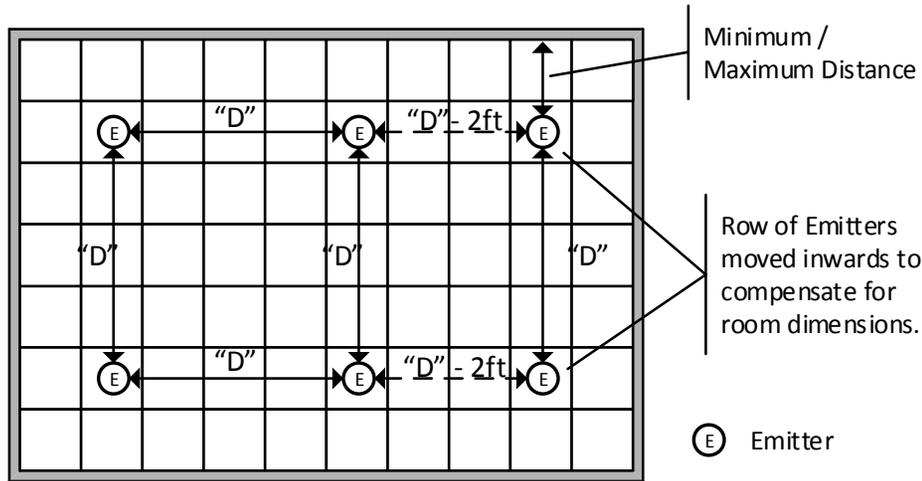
Standard Layout with 2' x 2' ceiling tiles with an adjustment for the room size.
